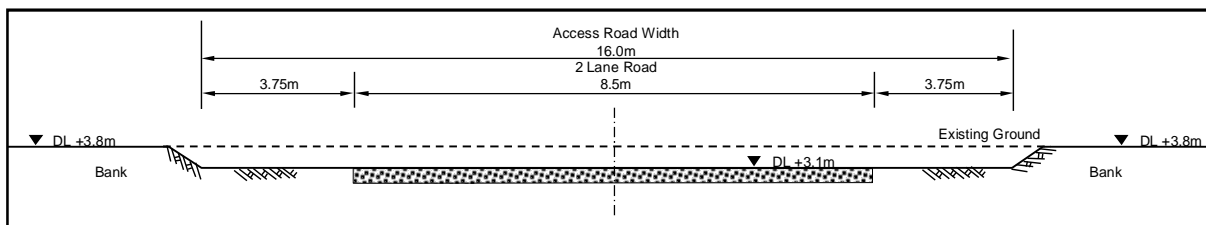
Cross Section of Bank Portion of South Access Road
